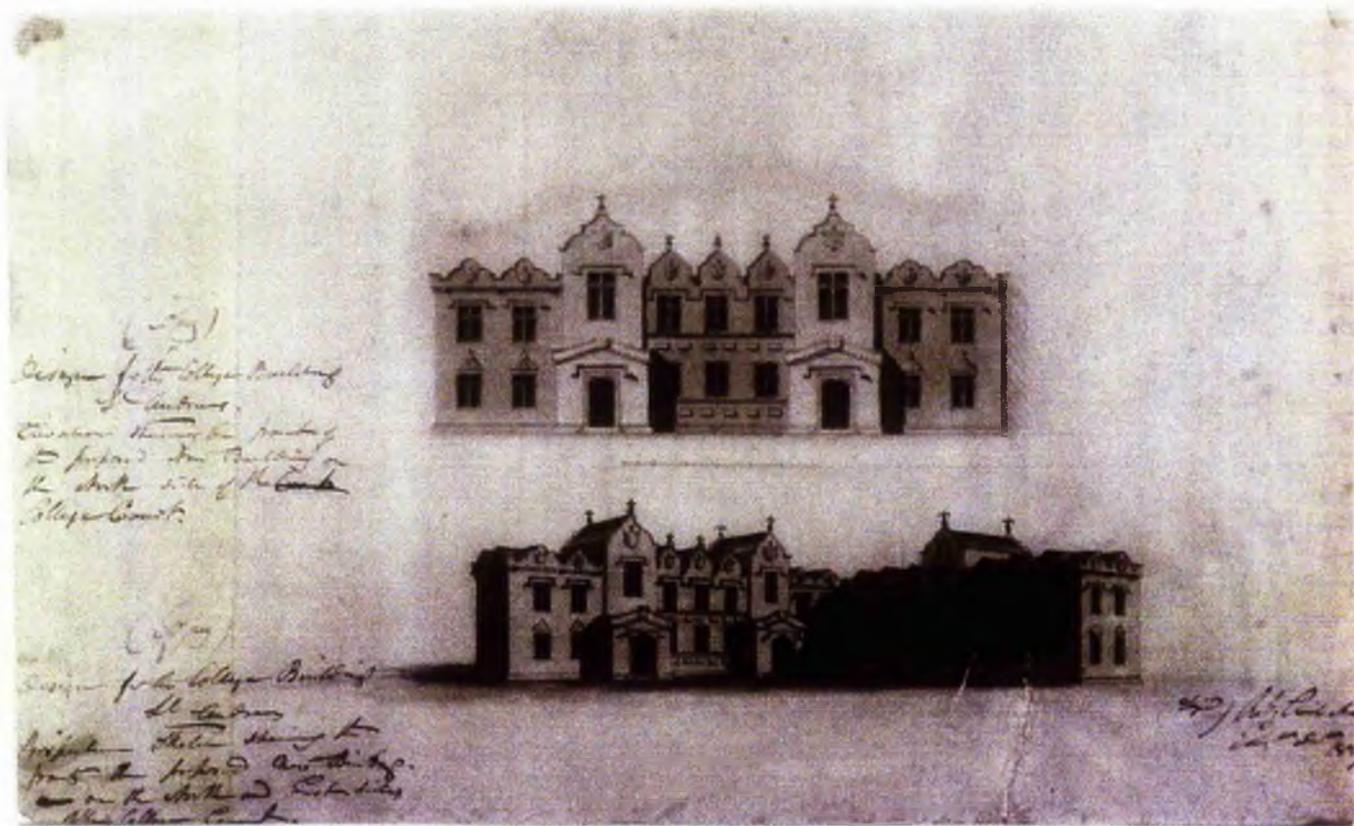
United College. Perspective sketch showing proposed new east and north wings. R. Reid, December, 1827.
